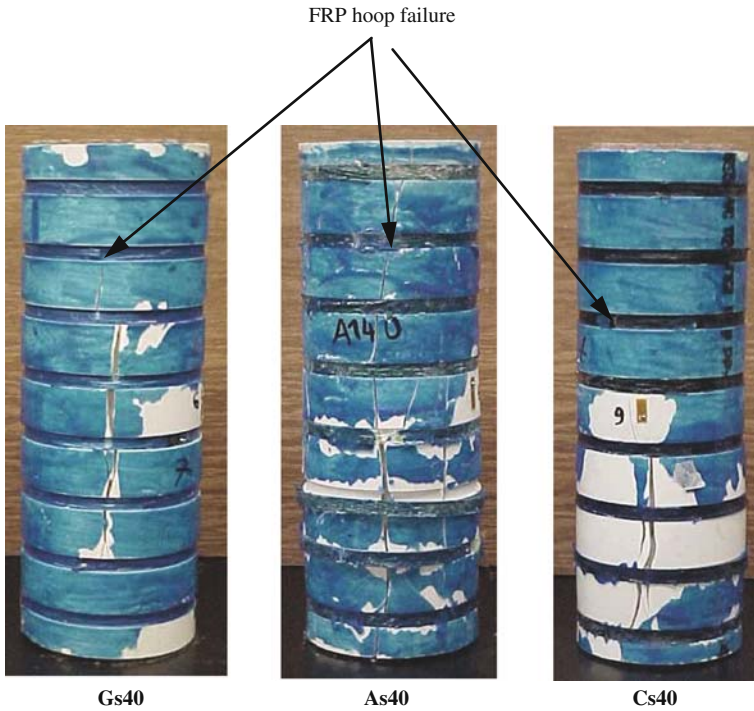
Typical failure mode of PVC-FRP confined concrete specimens (see also Fig. 6.8 on page 119)
